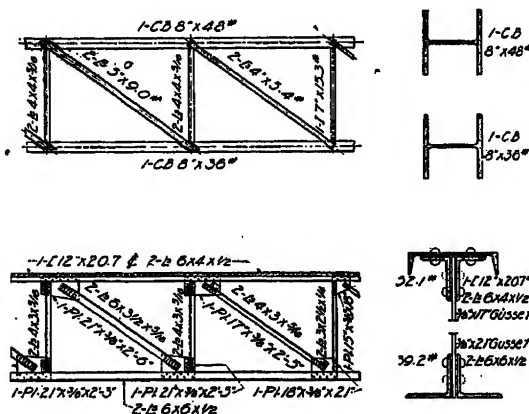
WELDED AND RIVETED TYPICAL PANELS AND CHORD SECTIONS PRATT TYPE TRUSS
